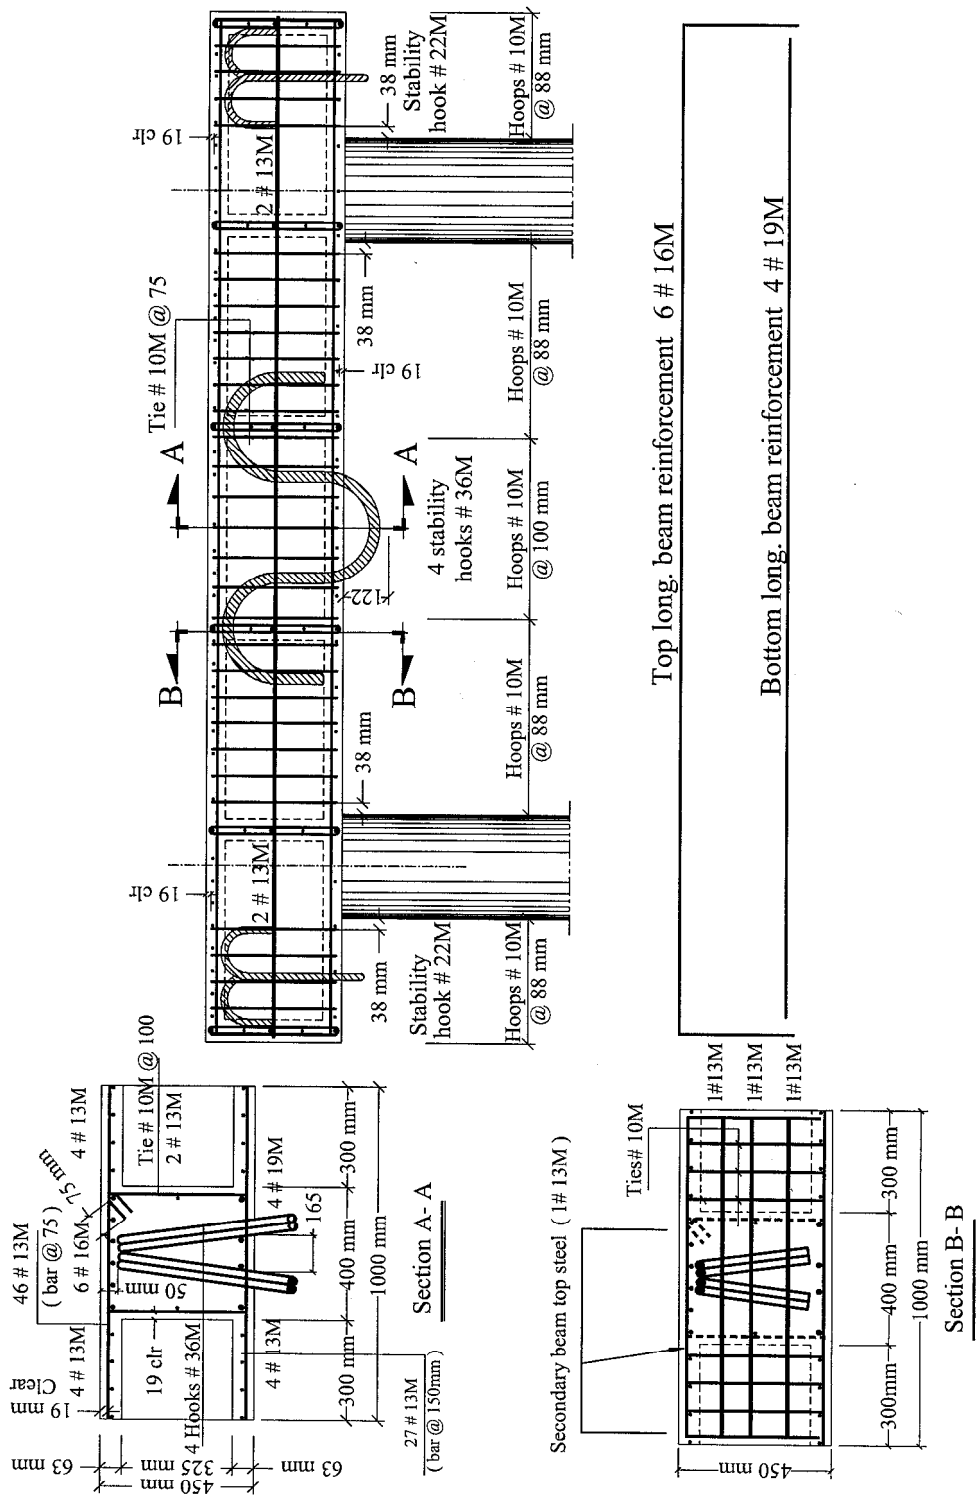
Details of Beam Reinforcement of both Specimens B2CT and B2CM, (SI Units)
